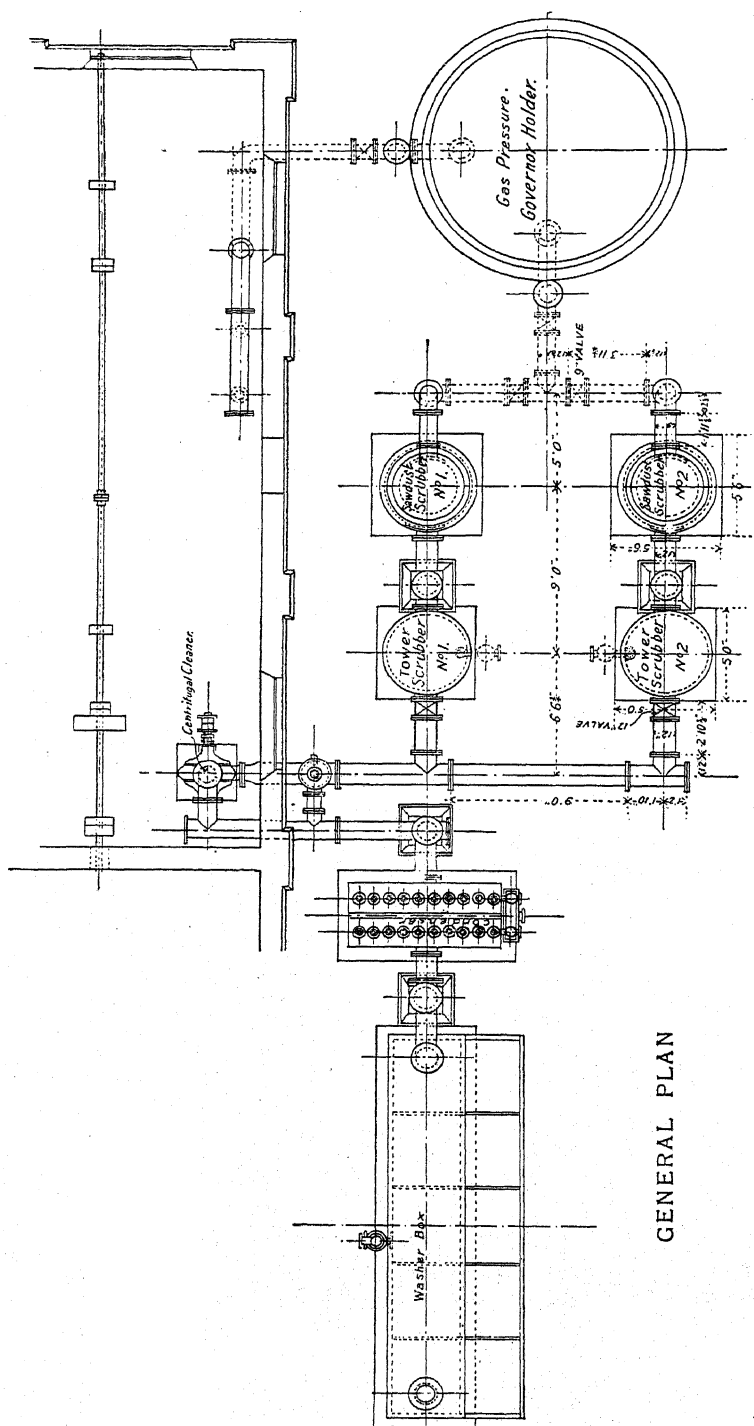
THWAITE BLAST-FURNACE GAS-CLEANING PLANT INSTALLED IN 1889 AT THE WORKS OF THE SHEEPBRIDGE IRON CO.
